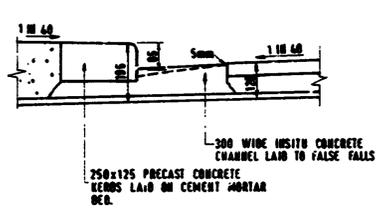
DETAIL OUTSIDE CARRIAGEWAY WIDTHS SCALE 1:10
